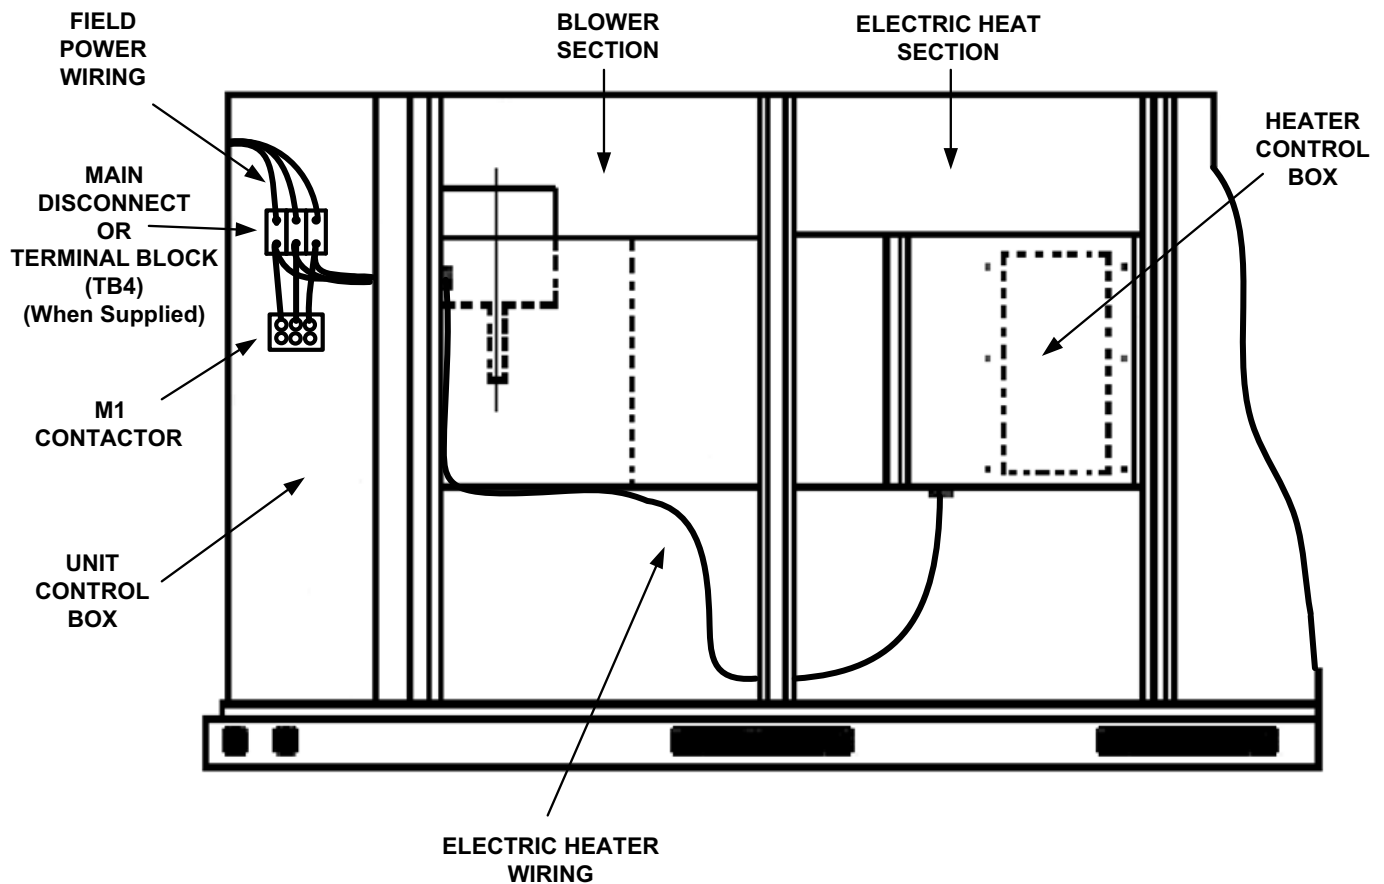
TYPICAL HEATER INSTALLATION FOR SINGLE PACKAGE AIR CONDITIONERS MODELS: ZE, ZD, JZE, ZF, ZS, JZF, ZR, ZK, AND JZR 3 THRU 6 TON AND SINGLE PACKAGE HEAT PUMPS MODELS: XN, XT, JXN, XP, XA AND JXP 3 THRU 5 TON
